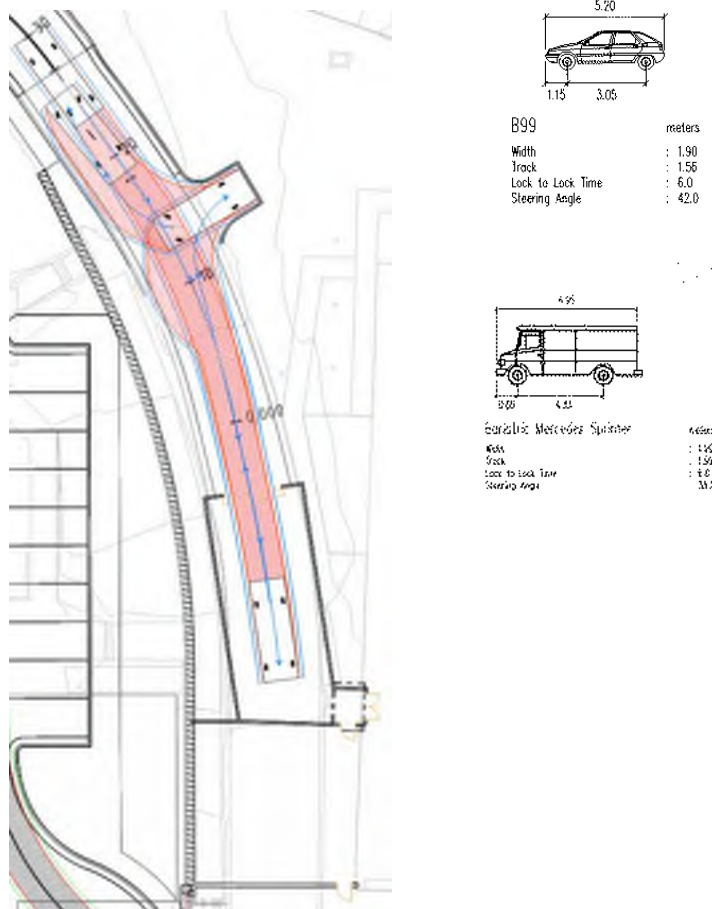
Hospital Road South of New Wing – 12.5m Truck Fueling Bay & Substation Access
